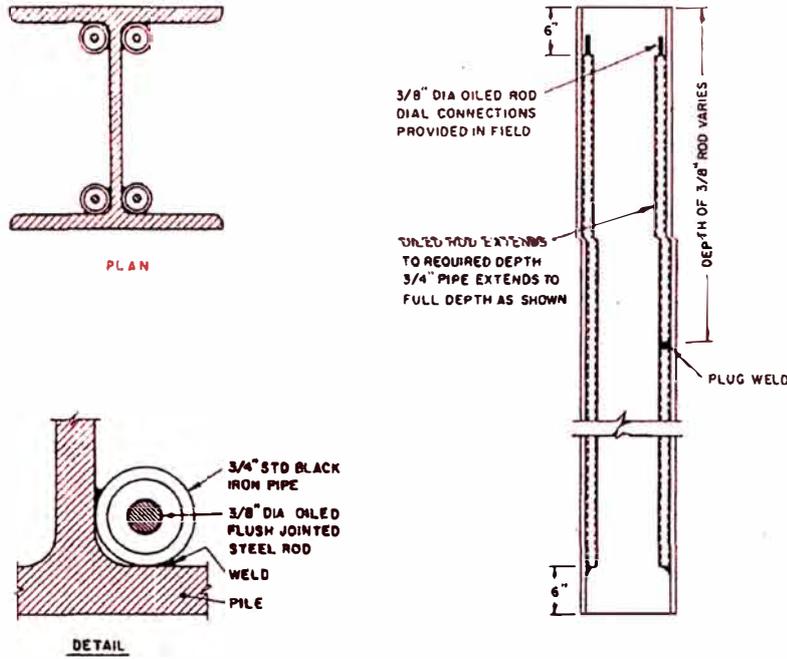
Possible Installation of Telltales for Steel H-Piles
